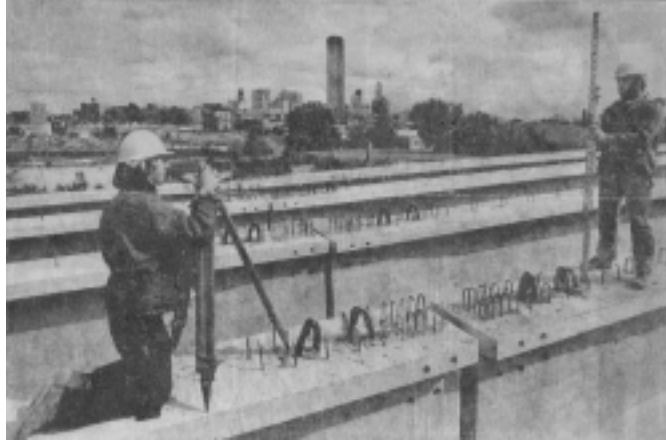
Conventional Approach to Measuring Bridge Beam Camber
